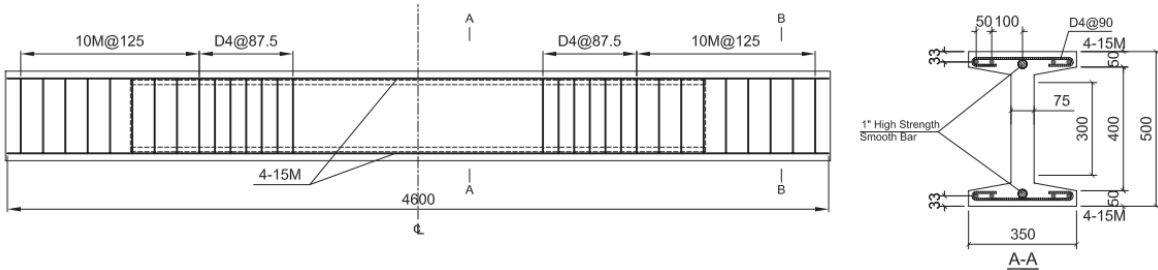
Shear reinforcement in the beam LB11 [13]
